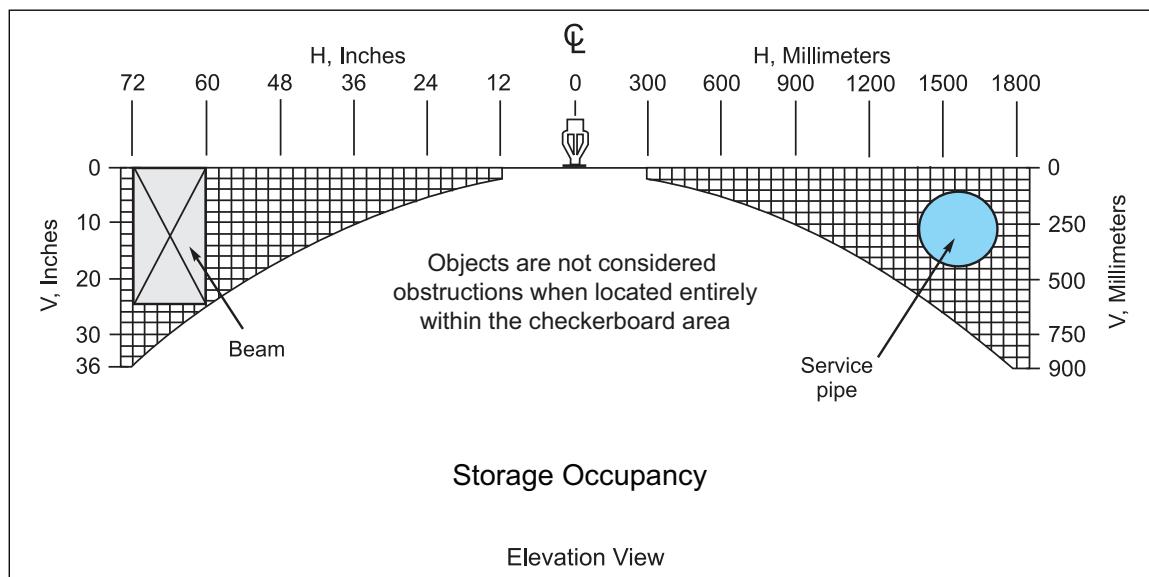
(a). Objects near ceiling level not considered obstructions to standard-coverage Storage sprinklers
